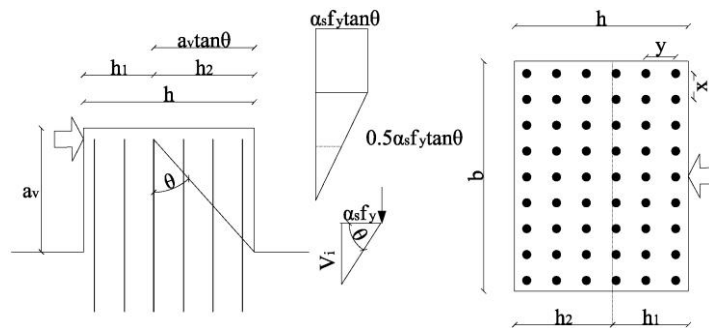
Corbel's characteristics and arrangement of reinforcement in plan
